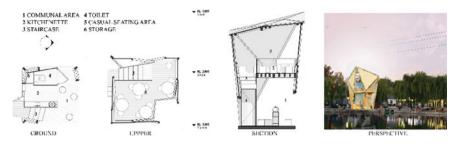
Ternary Shed, drawings and perspective of and relaxation house layout
